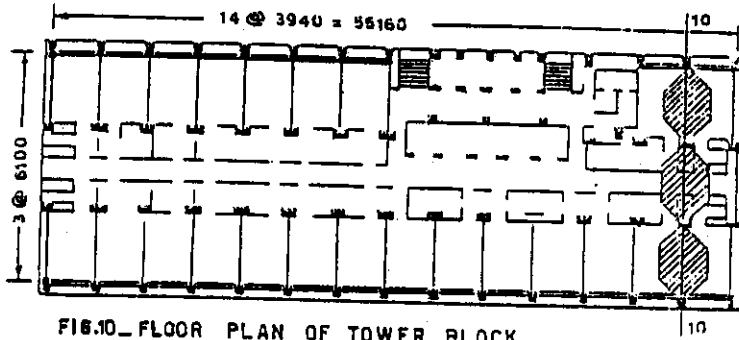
FLOOR PLAN OF TOWER BLOCK
